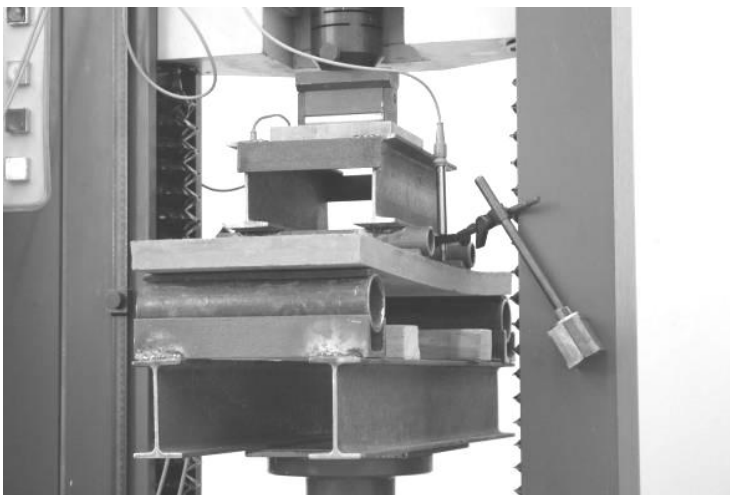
Thin slab specimen (thickness 30 mm) subjected to 4 – point bending test
